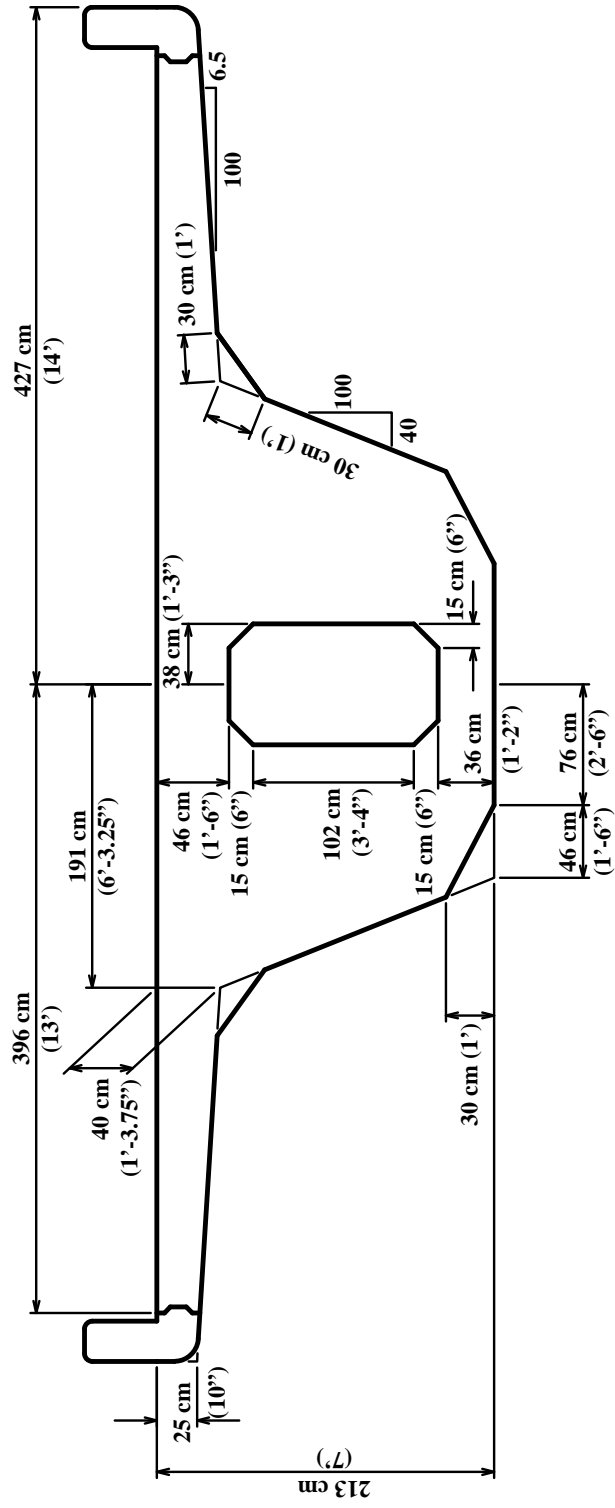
Dimensions for Ramp P interior anchorage segment cross-section
